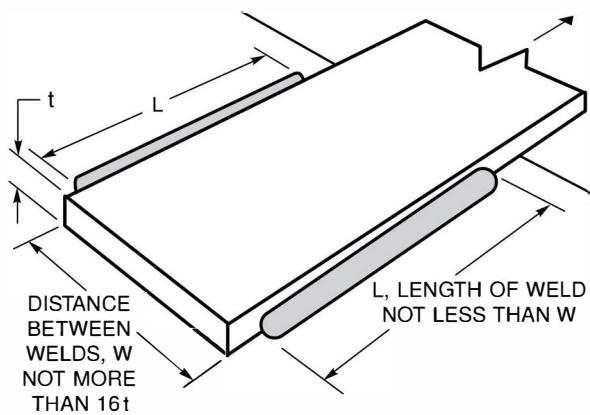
Minimum Length of Longitudinal Fillet Welds at End of Plate or Flat Bar Members (see 4.9.2)
